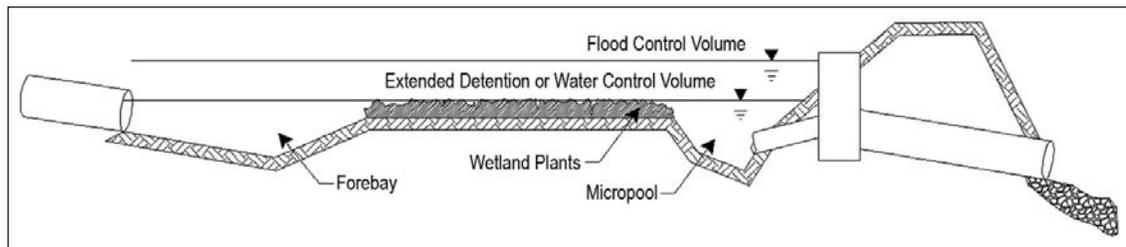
Wetland Storm Water Pond with Extended Detention and Flood Control Volumes
